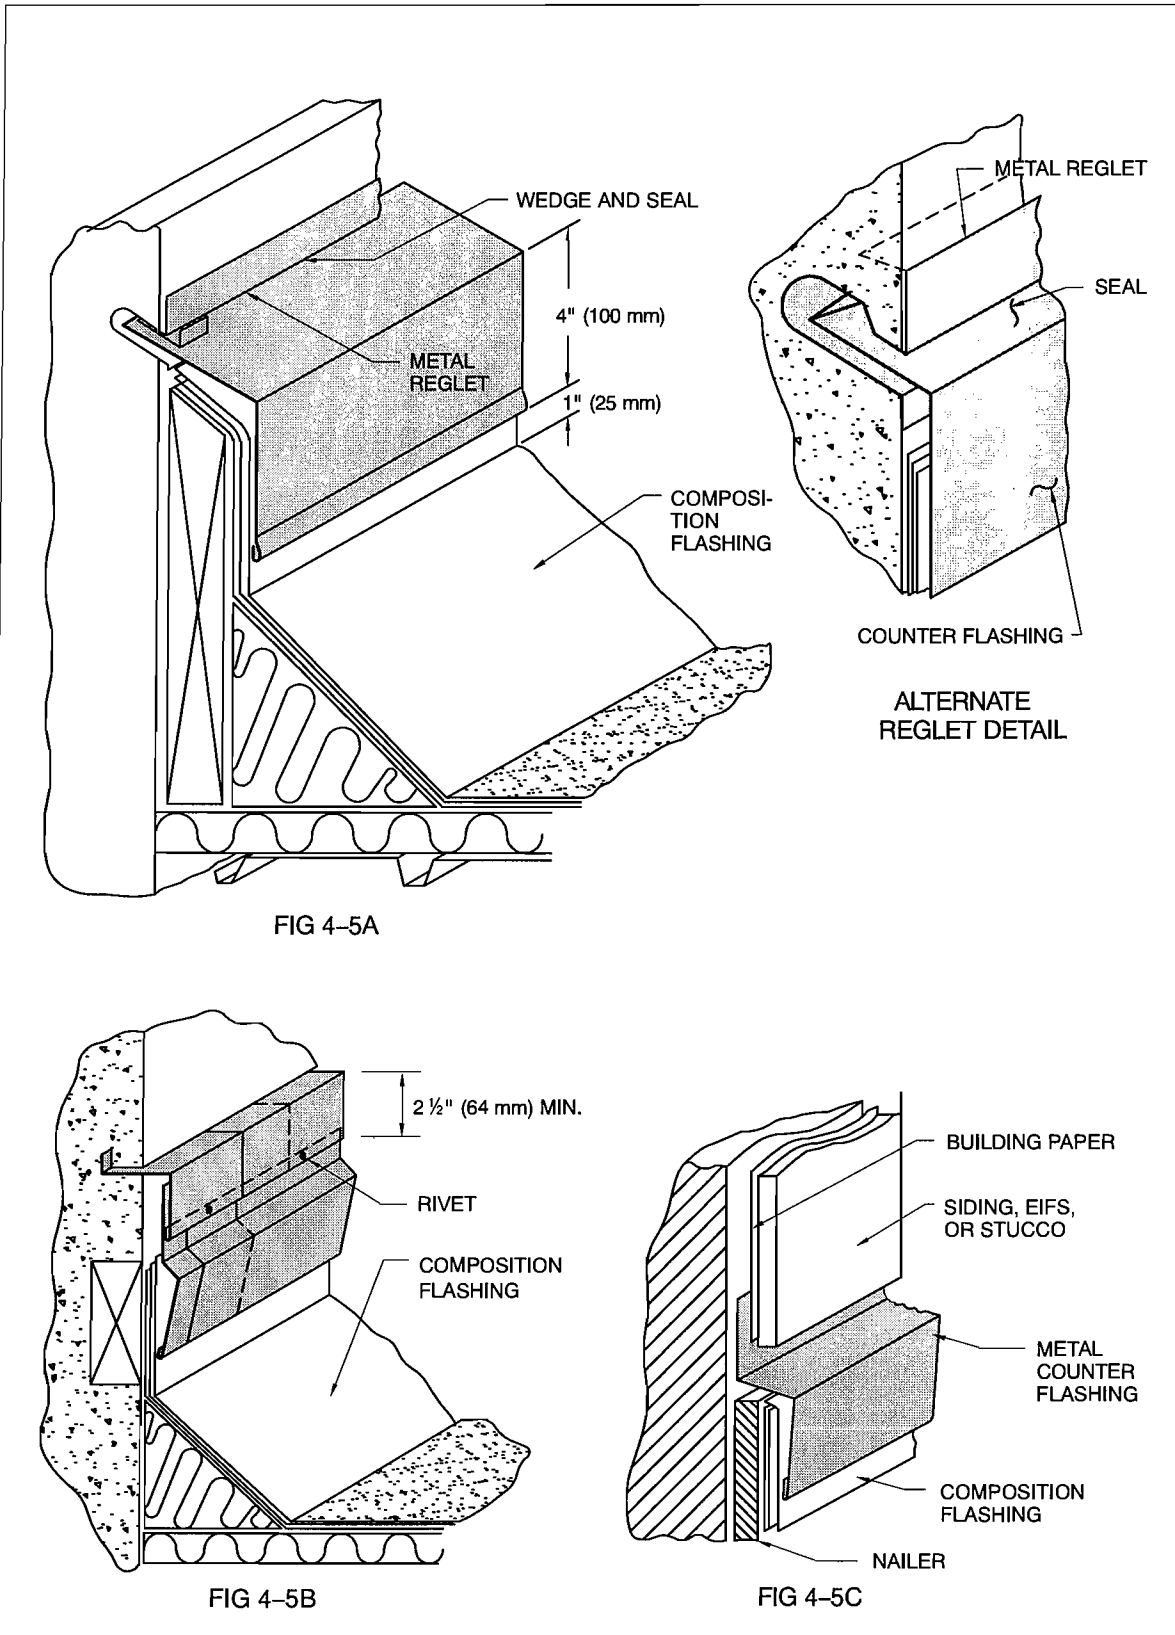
COUNTER FLASHING SYSTEMS — INSTALLATION
